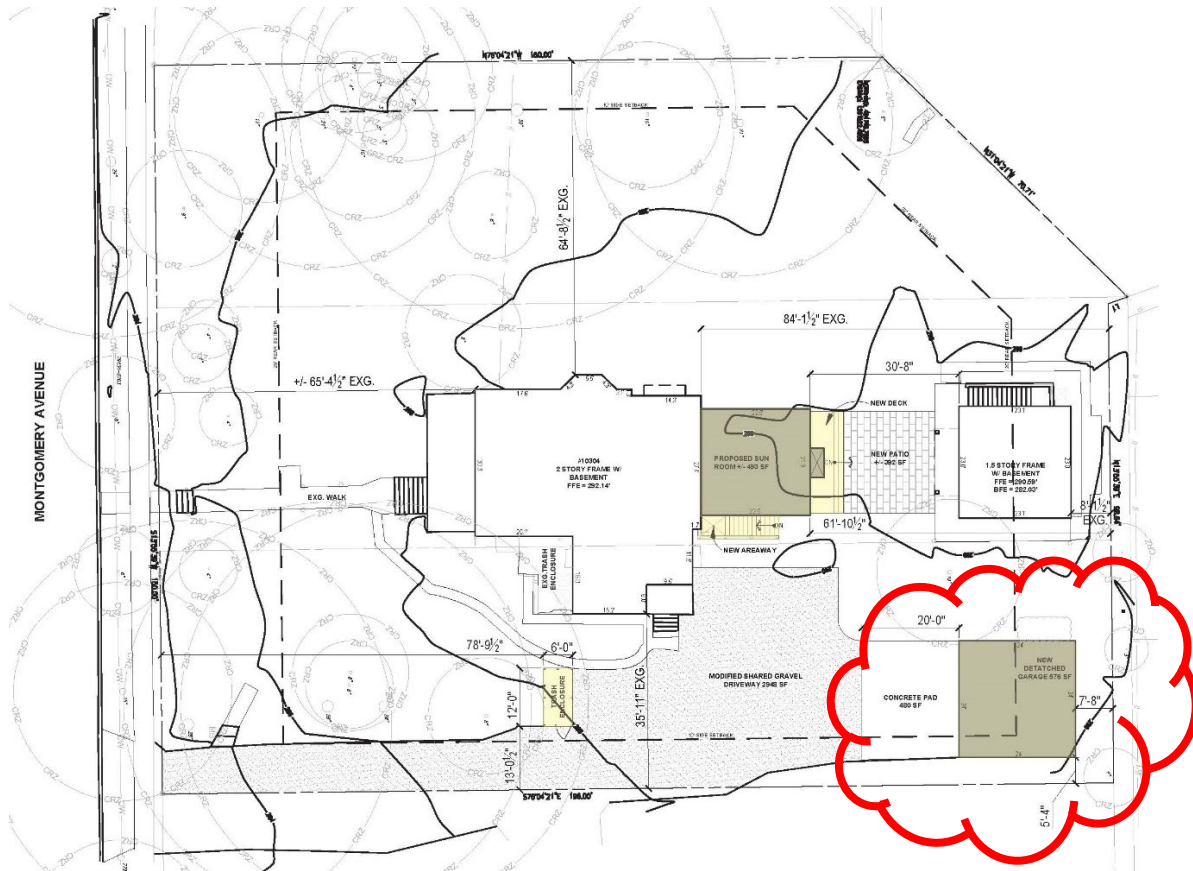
The proposed site plan shows the location of the proposed garage clouded in red.
